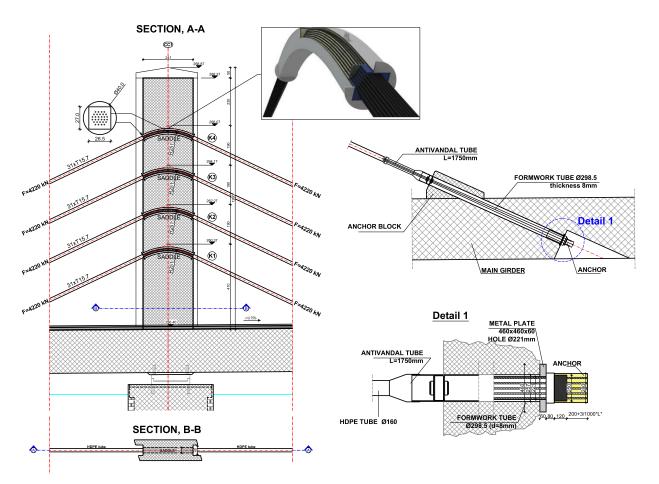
Detail of a pylon, saddle and anchorage of a cable into the main girder
